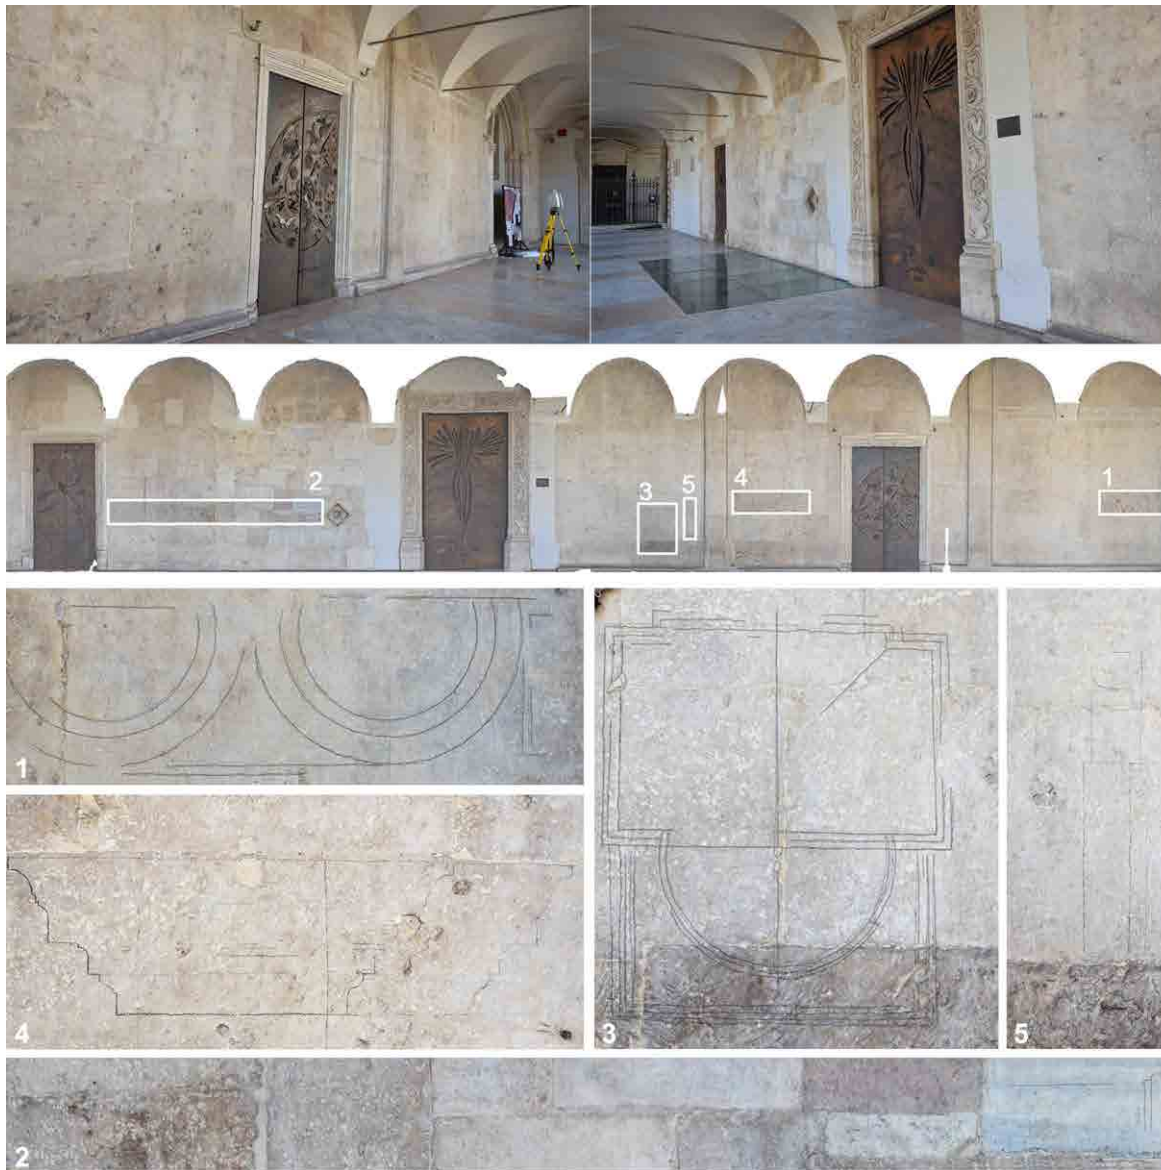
Detail of worksite tracing on the counterfaçade.
